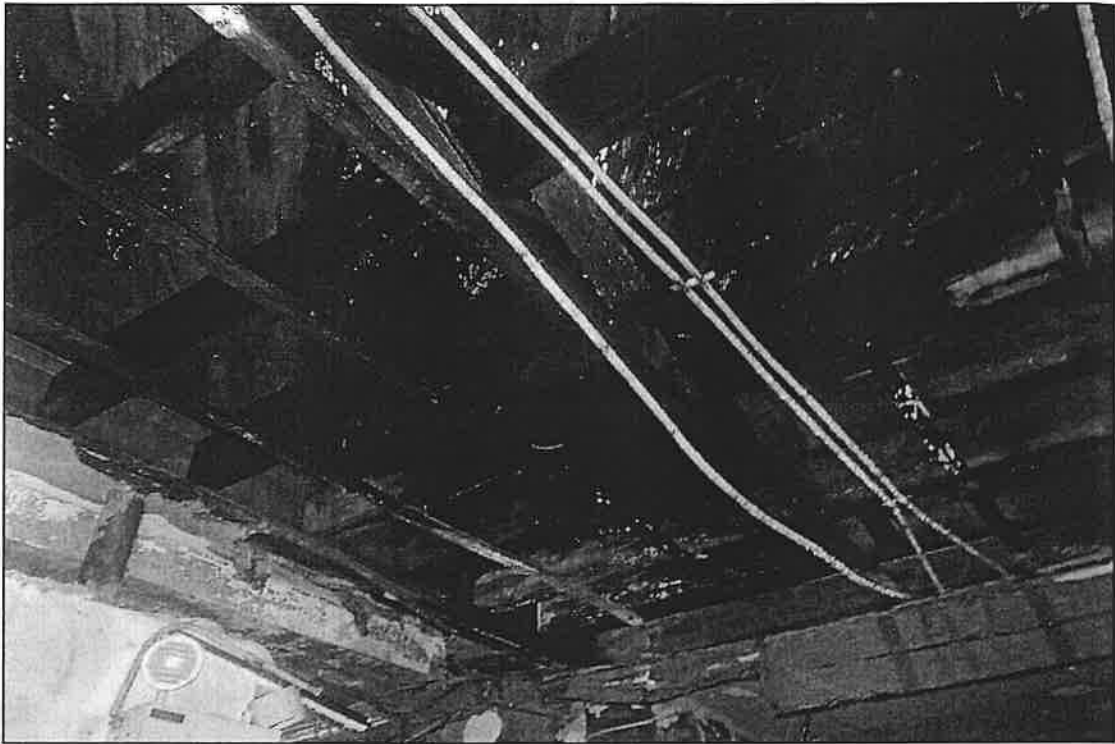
Minor Deterioration of Exposed Timber and Steel Framing
